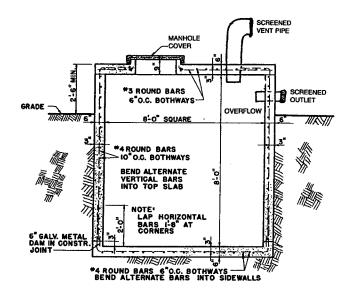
Cross section of 8' x 8' cistem showing overflow pipe, manhole, and vent pipe.
